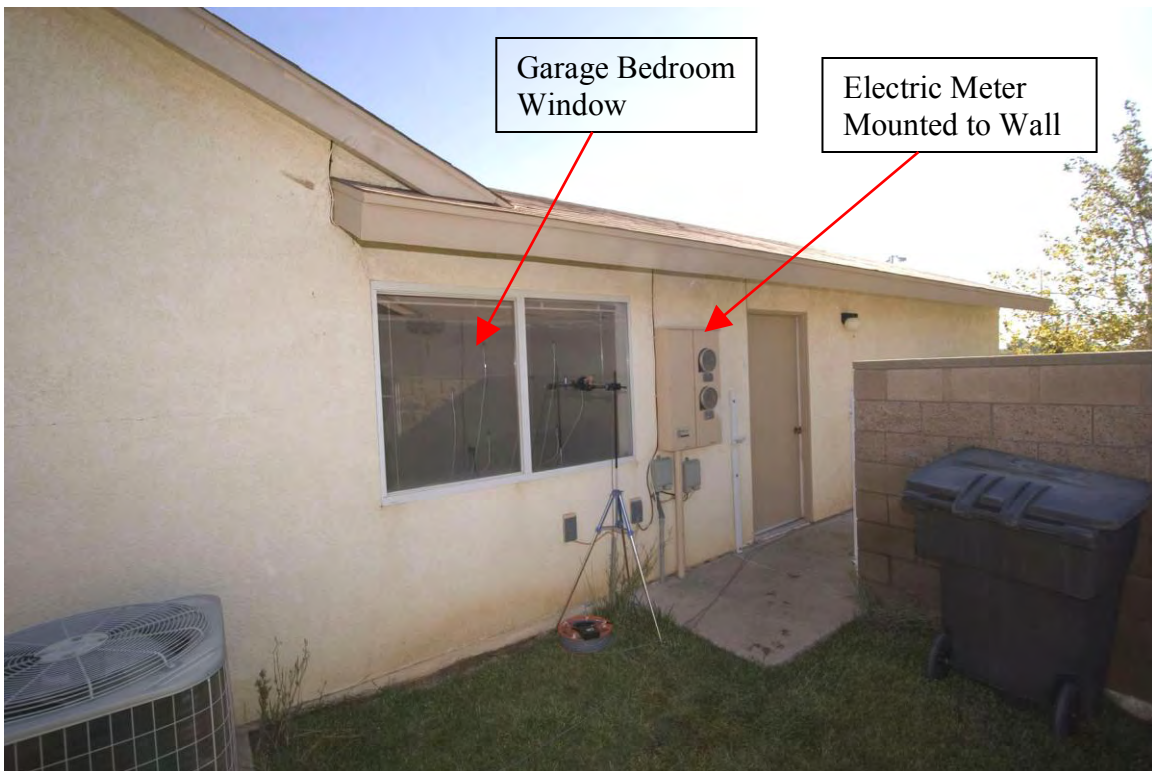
View of the side of the house looking north at the exterior wall of the garage bedroom.
